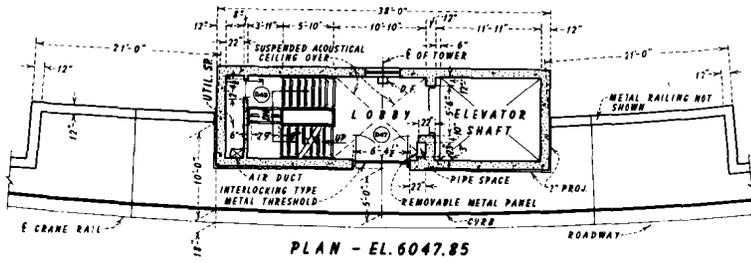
Structural and architectural layout of elevator shaft and tower in Flaming Gorge Dam (sheet 1 of 2).— 288-D-3081 (1/2)
